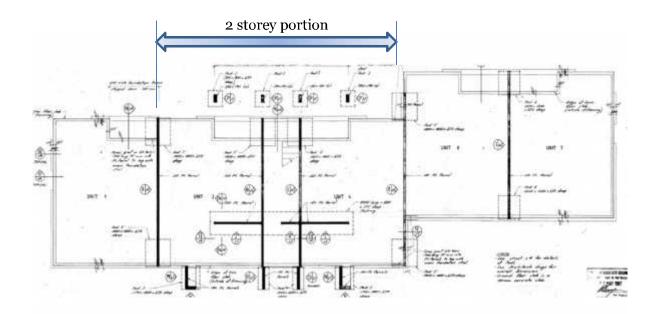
circa 1987 foundation plan for units 1-7, typical across the site (original).
